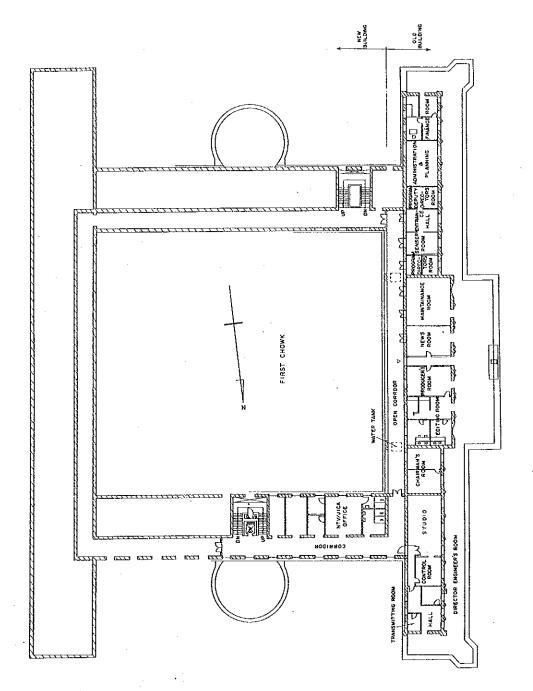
Plan of the Existing Broadcasting Station
